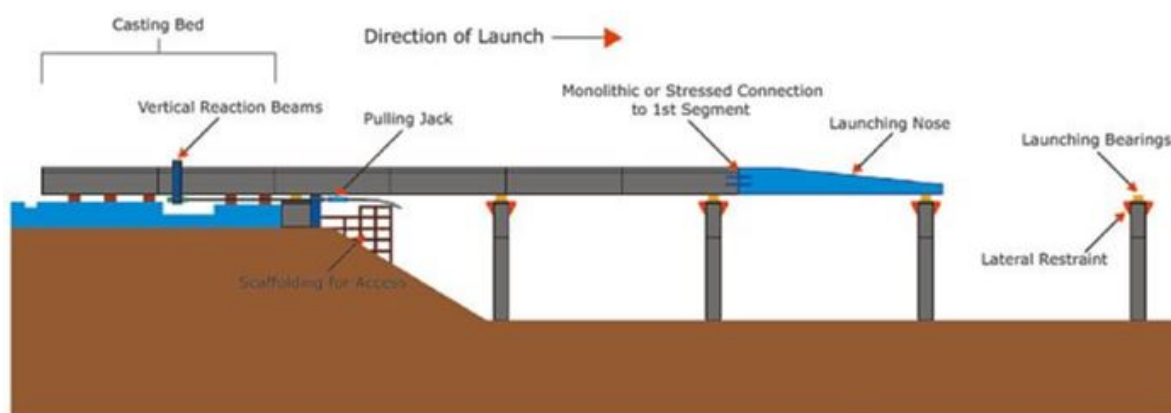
Building sequence of the box girder bridge with incremental launching. Source: en.vsl.cz/incremental-launching-method/
